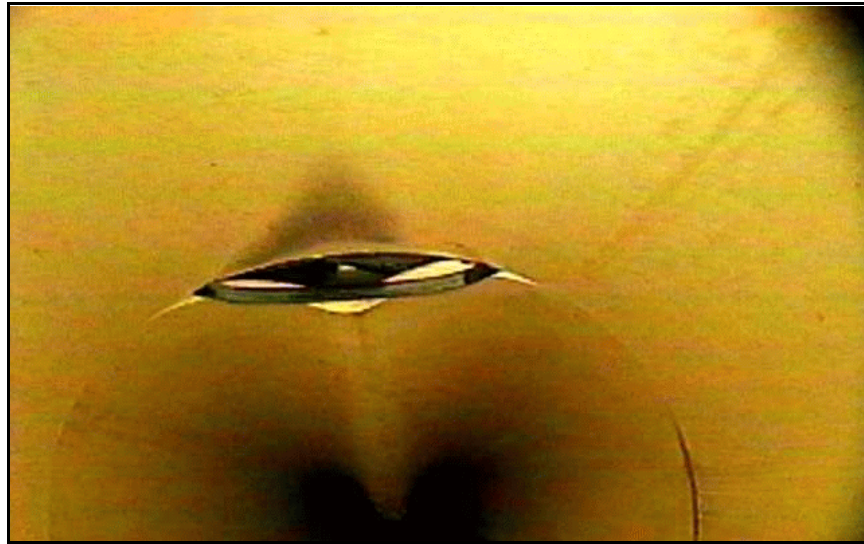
An open joint was discovered in a 16-inch PVC temporary diversion pipe under the 118-foot high embankment dam.
